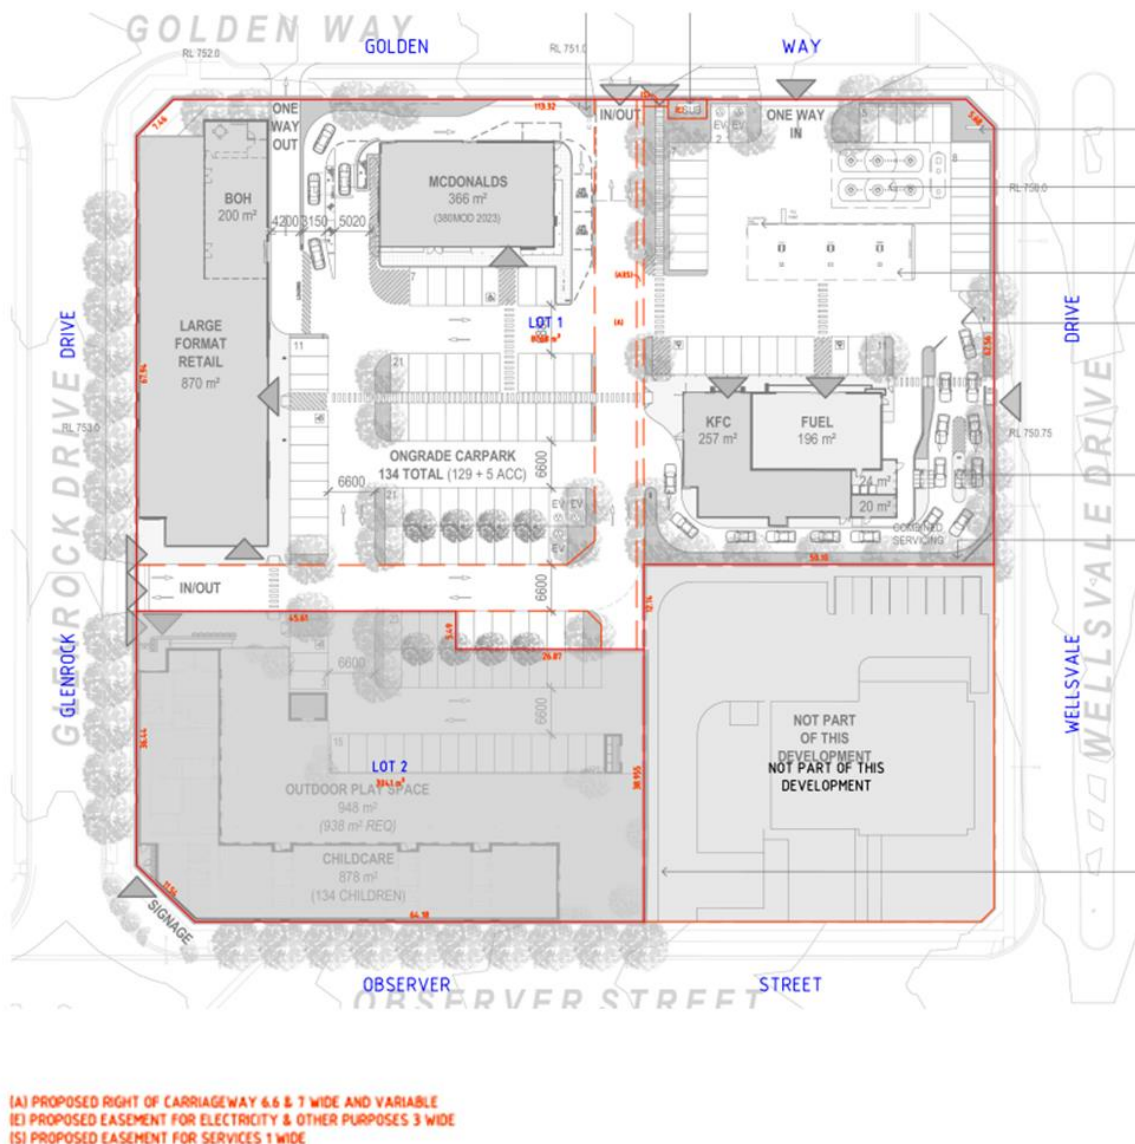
Proposed Subdivision Plan – 2 Torrens title lots
